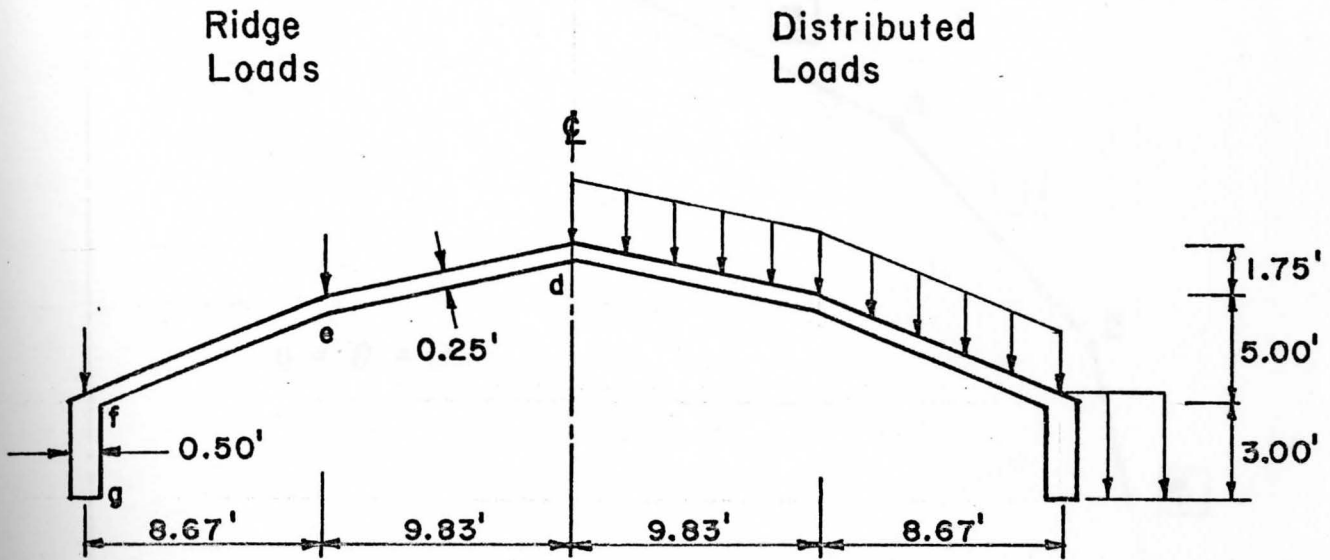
FOLDED PLATE SECTION, DIMENSIONS & LOADINGS
